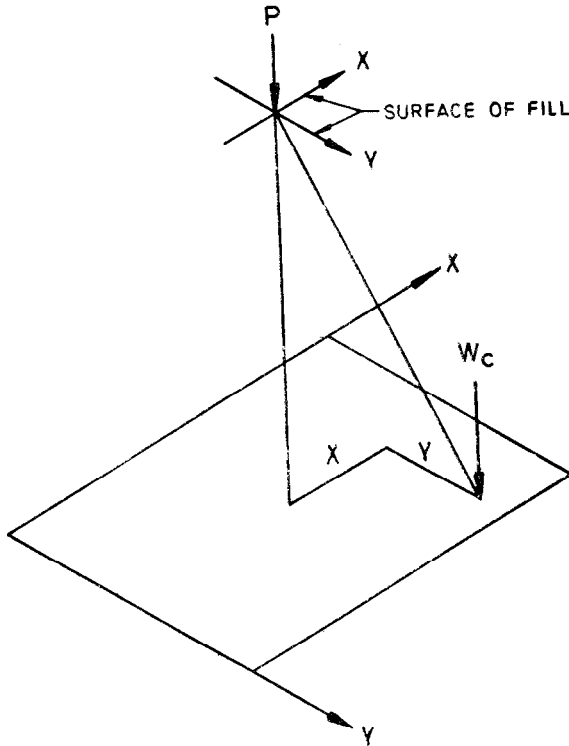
DIAGRAM OF SURFACE LOAD TO UNDERGROUND CONDUIT
